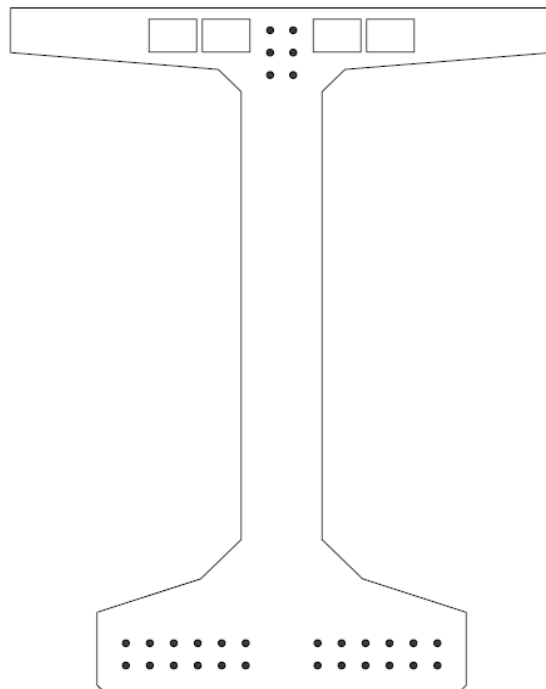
Sketch showing the arrangement of Type S6 monostrand anchorages in a PCBT girder having draped strands.
